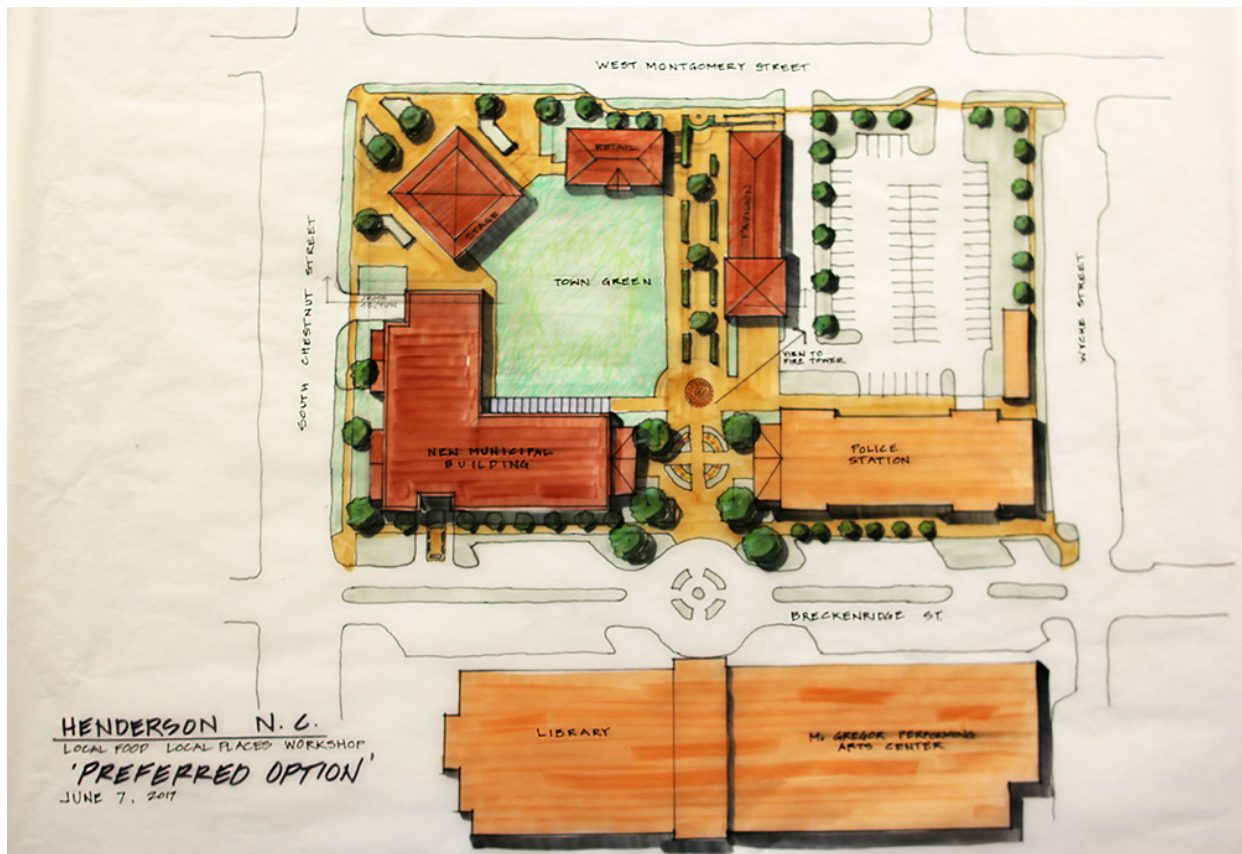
Proposed site plan for the Embassy Square site Image credit: Renaissance Planning
